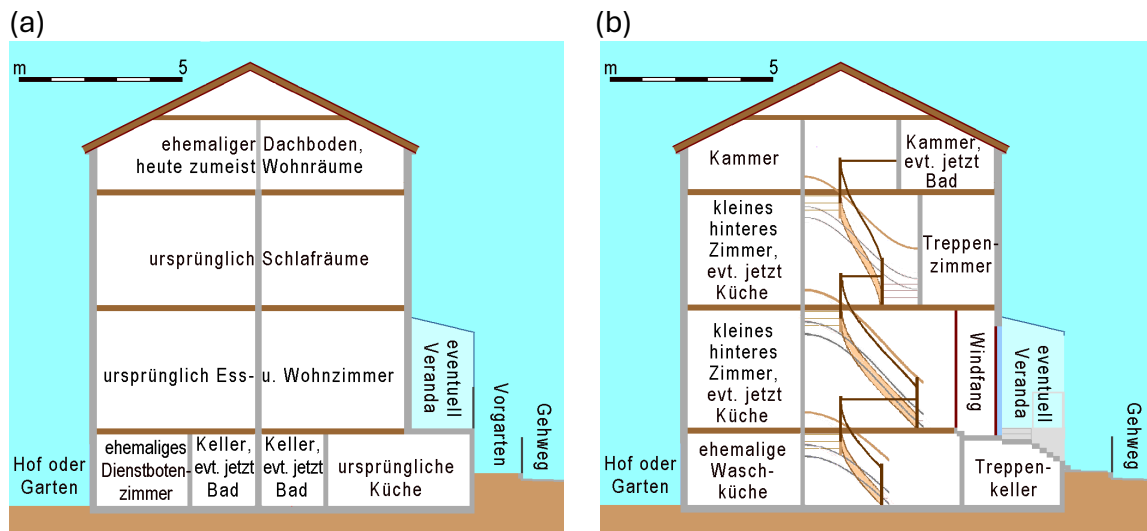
A simple illustration on the building design of typical Old Bremen Houses from side view (a) and (b). The building height was approximated as 10 meters. Source: [https://de.wikipedia.org/wiki/Bremer\\_Haus](https://de.wikipedia.org/wiki/Bremer_Haus)
